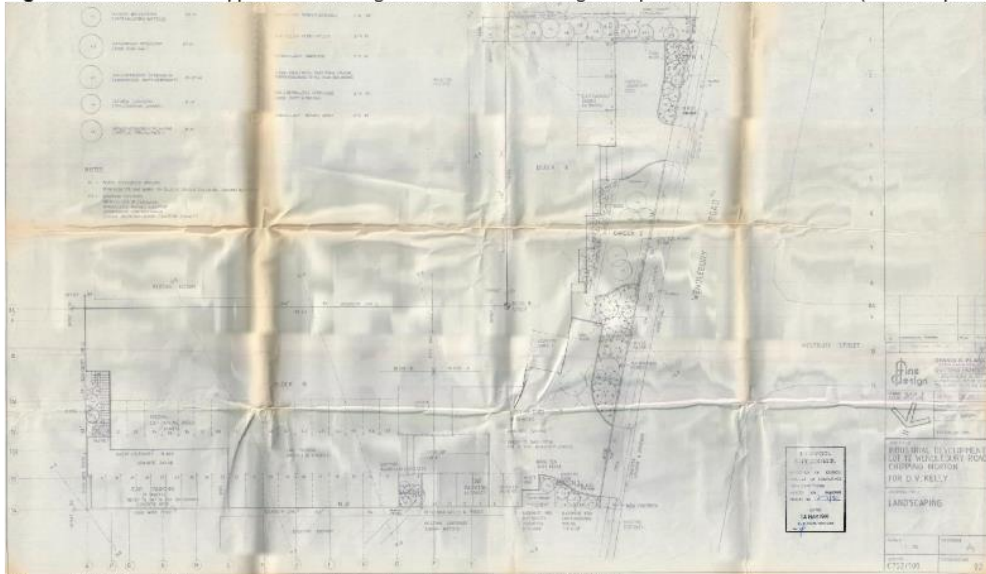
Extract of the approved landscaping plan under no. 211/1990
